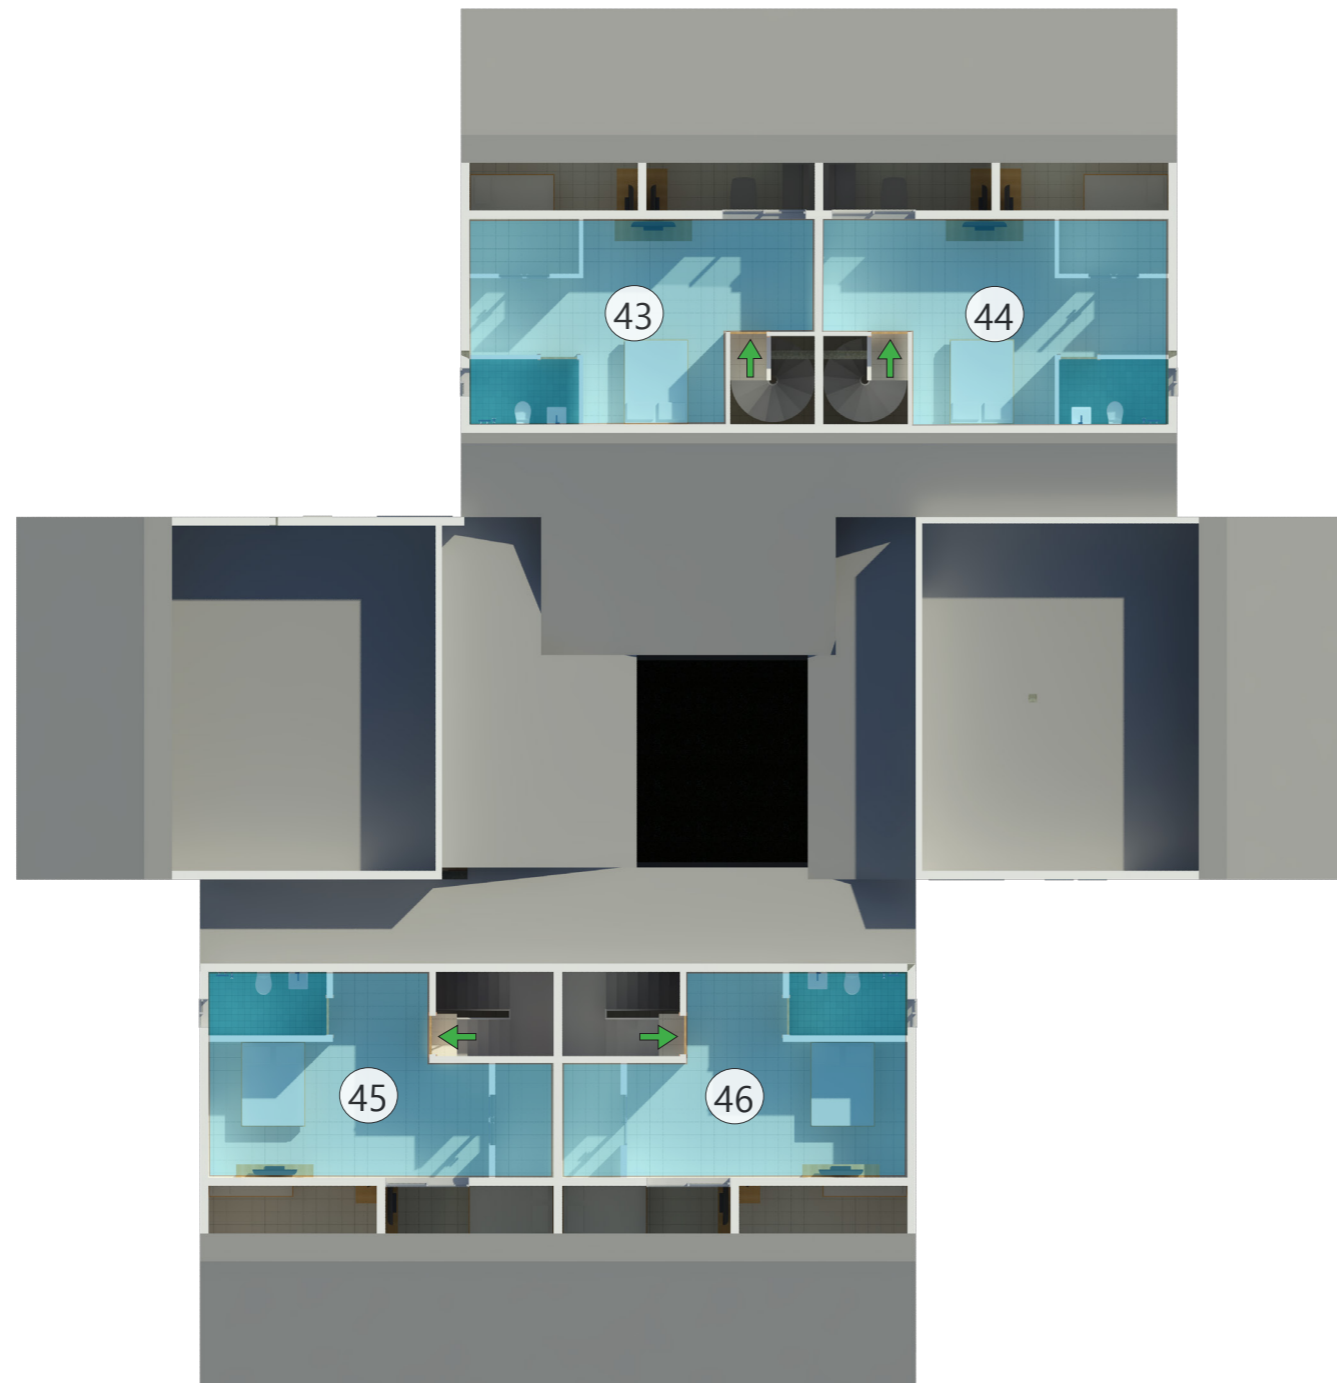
Room distribution plan view of the second level of Guest Block 16. Source: Own
